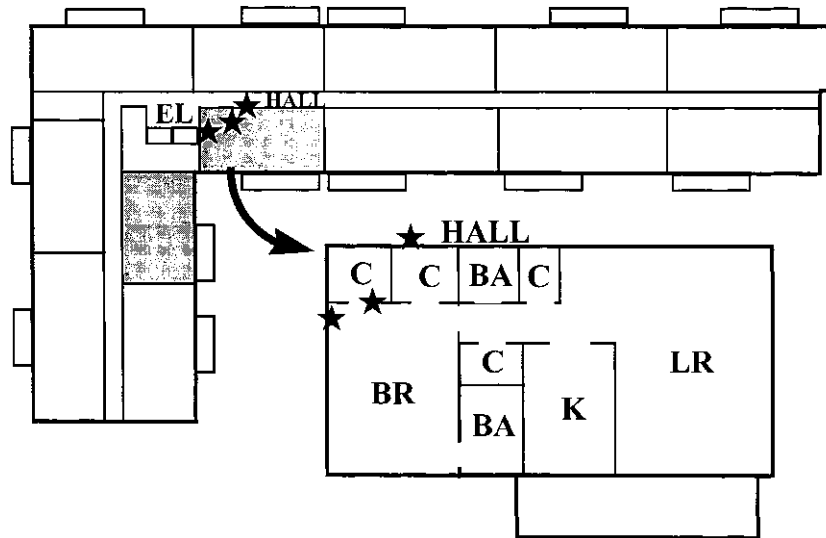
Floor plan of top (16th) floor of Condo1. Shaded areas are condominiums infested by Formosan subterranean termites prior to application of aboveground bait stations. Stars show placement sites for bait stations on baseboards in hallway (HALL) and master bedroom (BR) and on door trim of closet (C) of master bedroom; K = Kitchen, LR = Living room, BA = bathroom.
